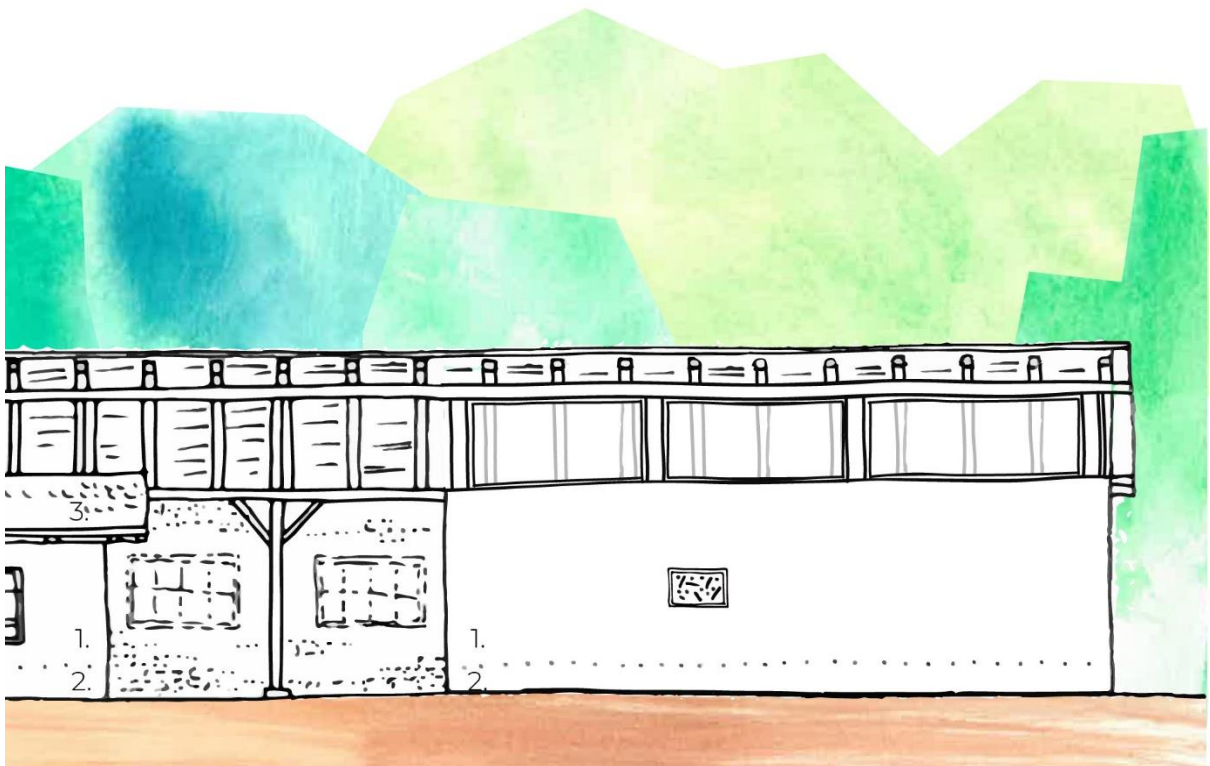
North-west façade of the visitor's facility, Part 2, scale 1:100
